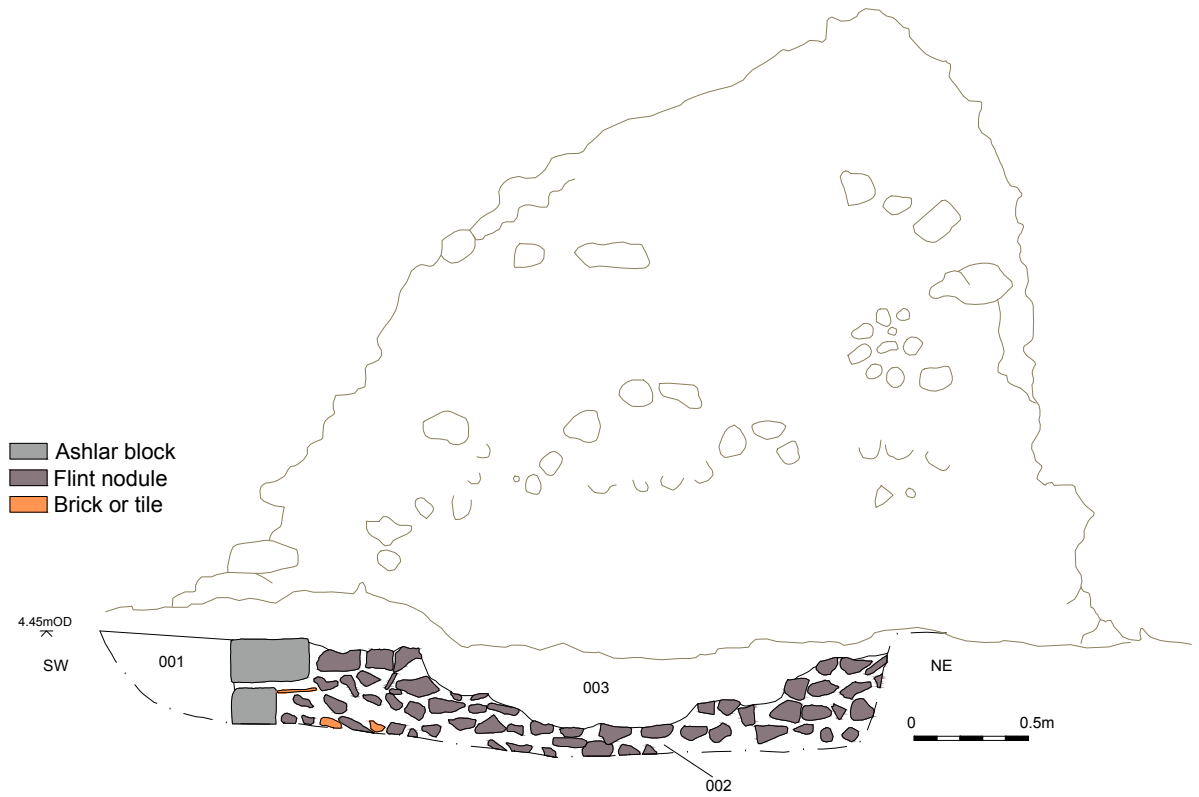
Section A1 - surviving above ground remains shown faded best fit (Cliveden Conservation 2011)
